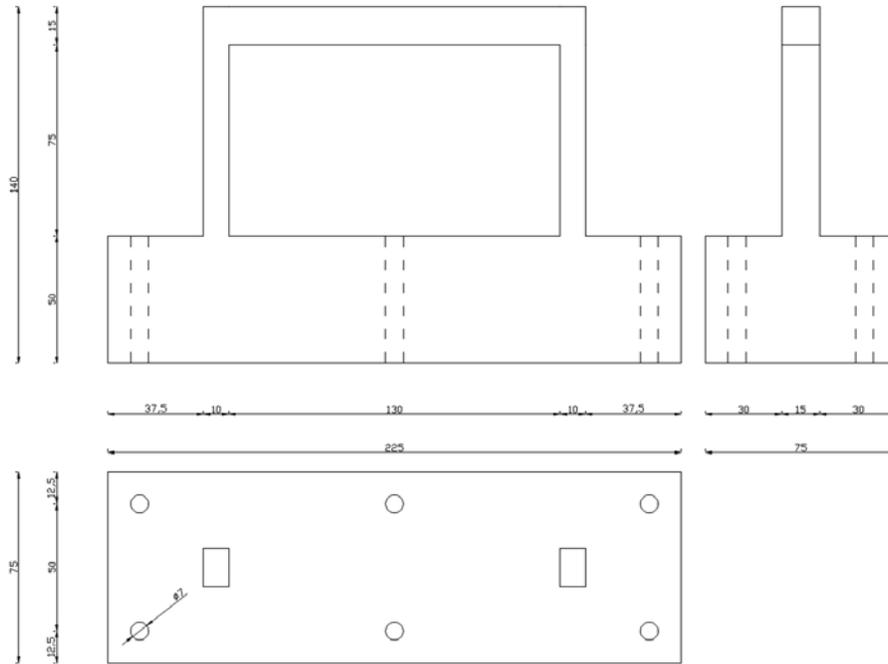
Geometric properties of the beam, columns and foundation of the test specimens
